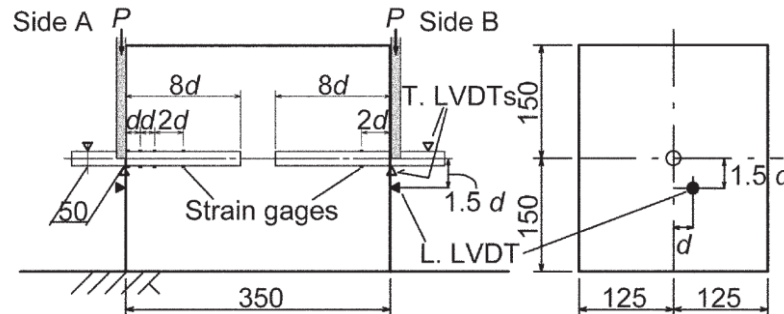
Test specimen, Tanaka [Ta2011]
